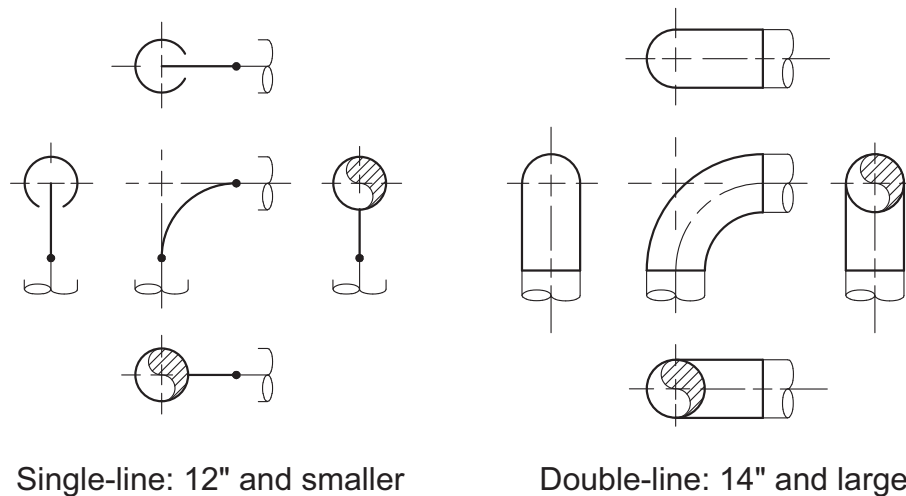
90° long-radius elbow orthographic drawing symbols.
